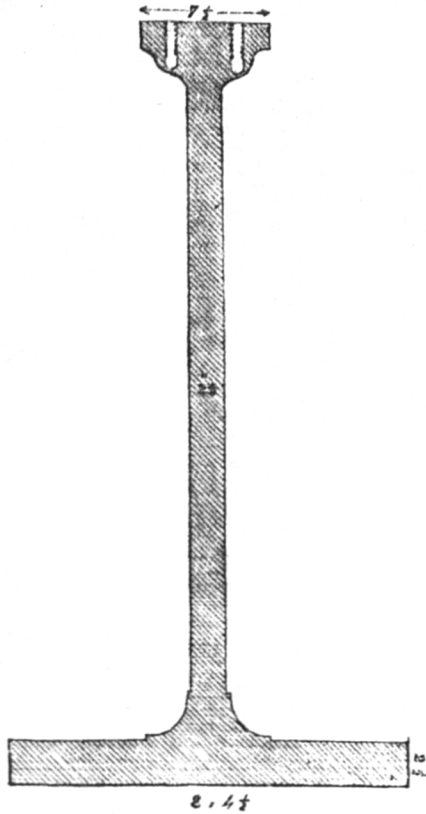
Section at Fracture A. Depth 3 ft. 9 in.
